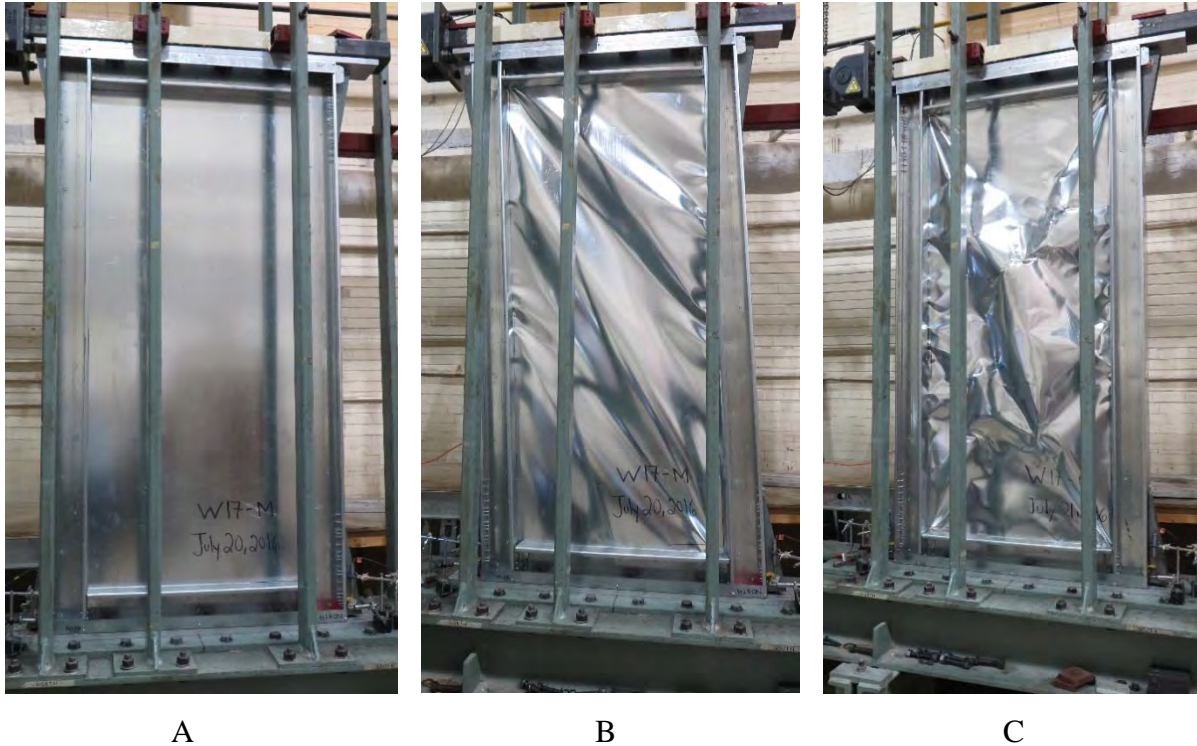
Sheathing shear buckling failure and tension field action. A) Specimen prior to testing. B) Specimen after monotonic test. C) Specimen after reversed cyclic test.
